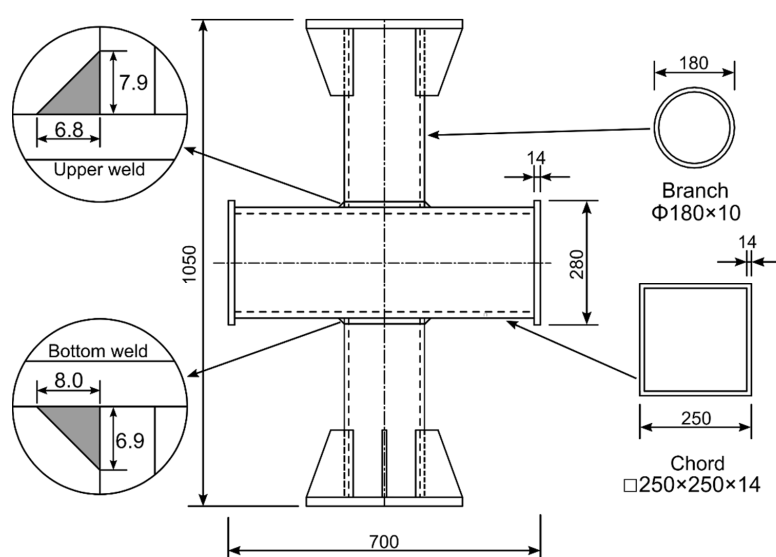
Geometry and configuration of the X90-2 joint specimen (unit: mm) [39,40].
